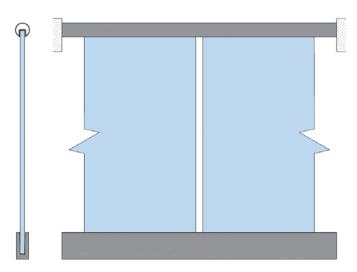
System γ : Version with continuous handrail and lateral end connection of the handrail
